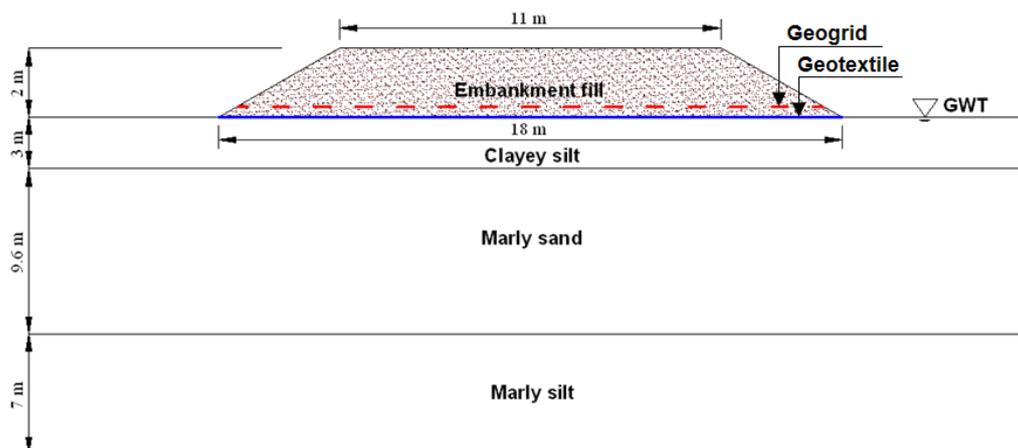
Generalized embankment geometry and foundation soil stratigraphy.
